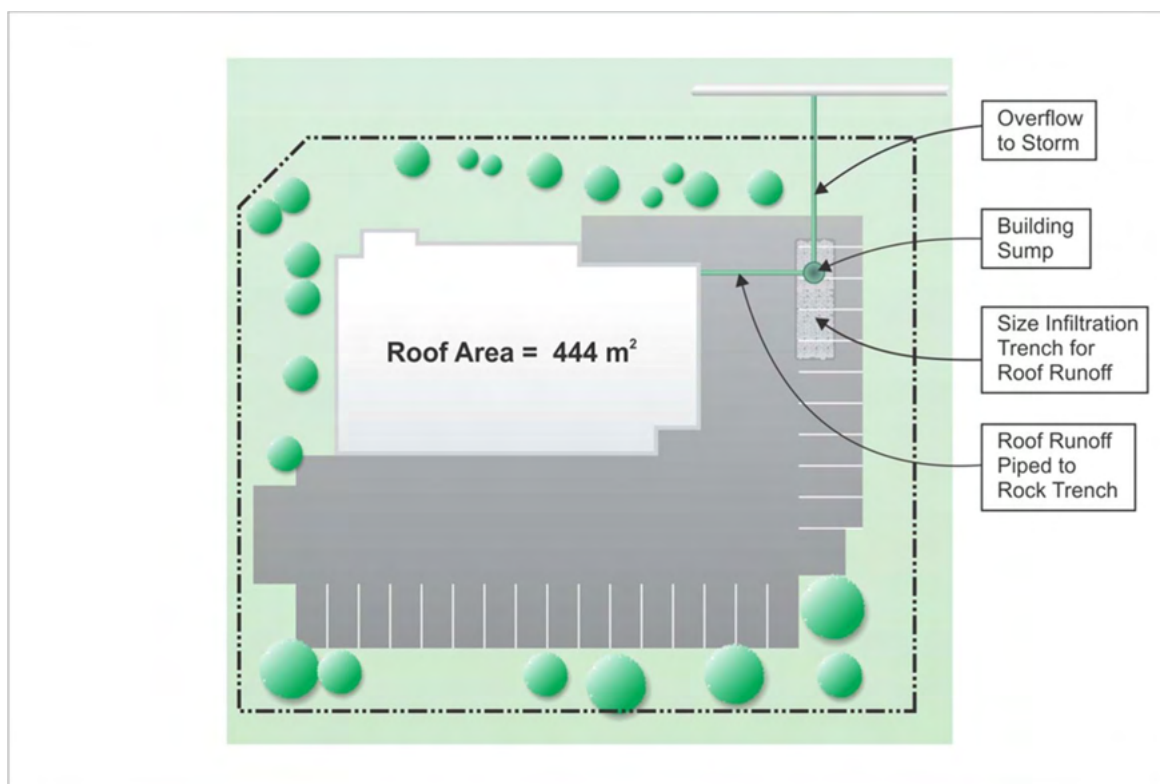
Example – Roof Area Draining to Infiltration Trench
